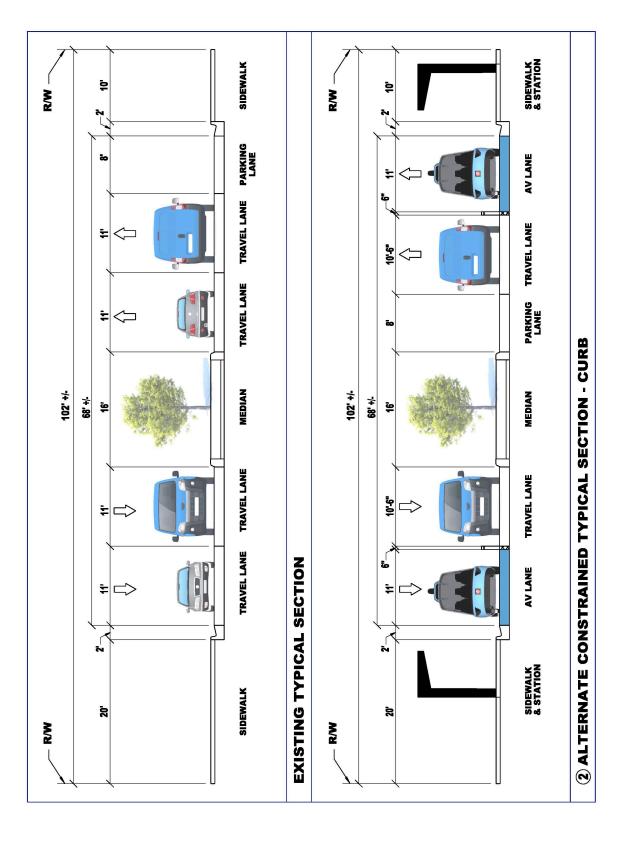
North Corridor Existing and Alternate Constrained Typical Section with Curbside Station – Main Street
